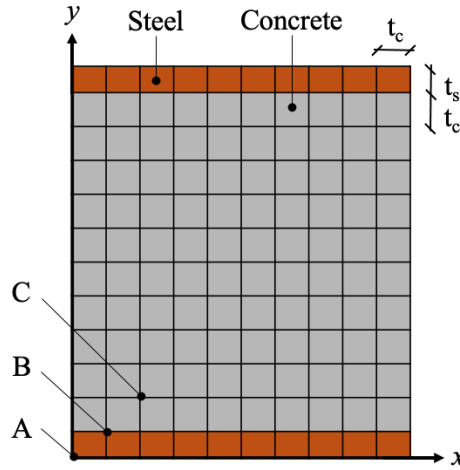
Discretized cross-section of a C-PSW/CF unit width column
